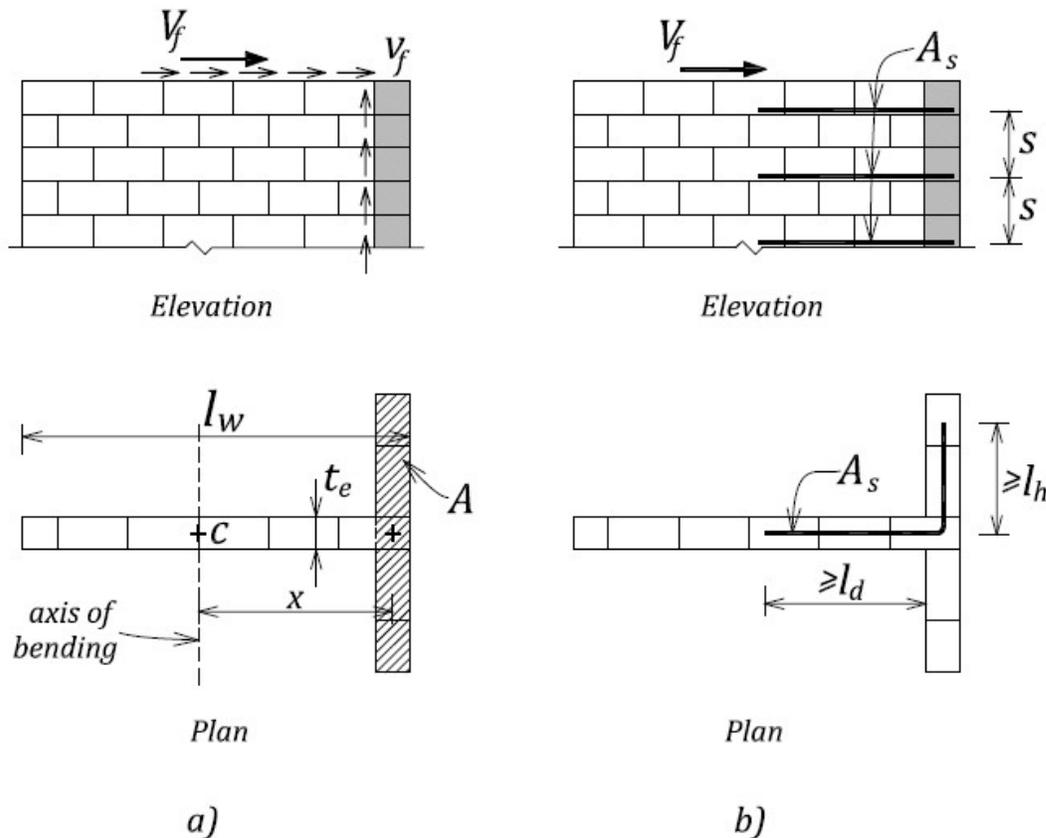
Shear resistance of the web-to-flange interface: a) bonded masonry intersection; b) horizontal reinforcement at the intersection.
